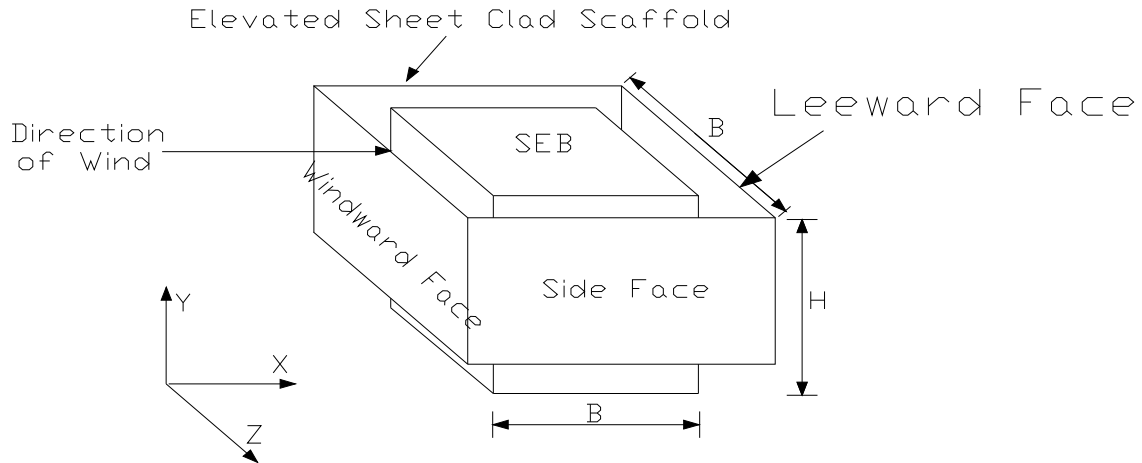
Scaled SEB surrounded by elevated impermeable sheet all around
